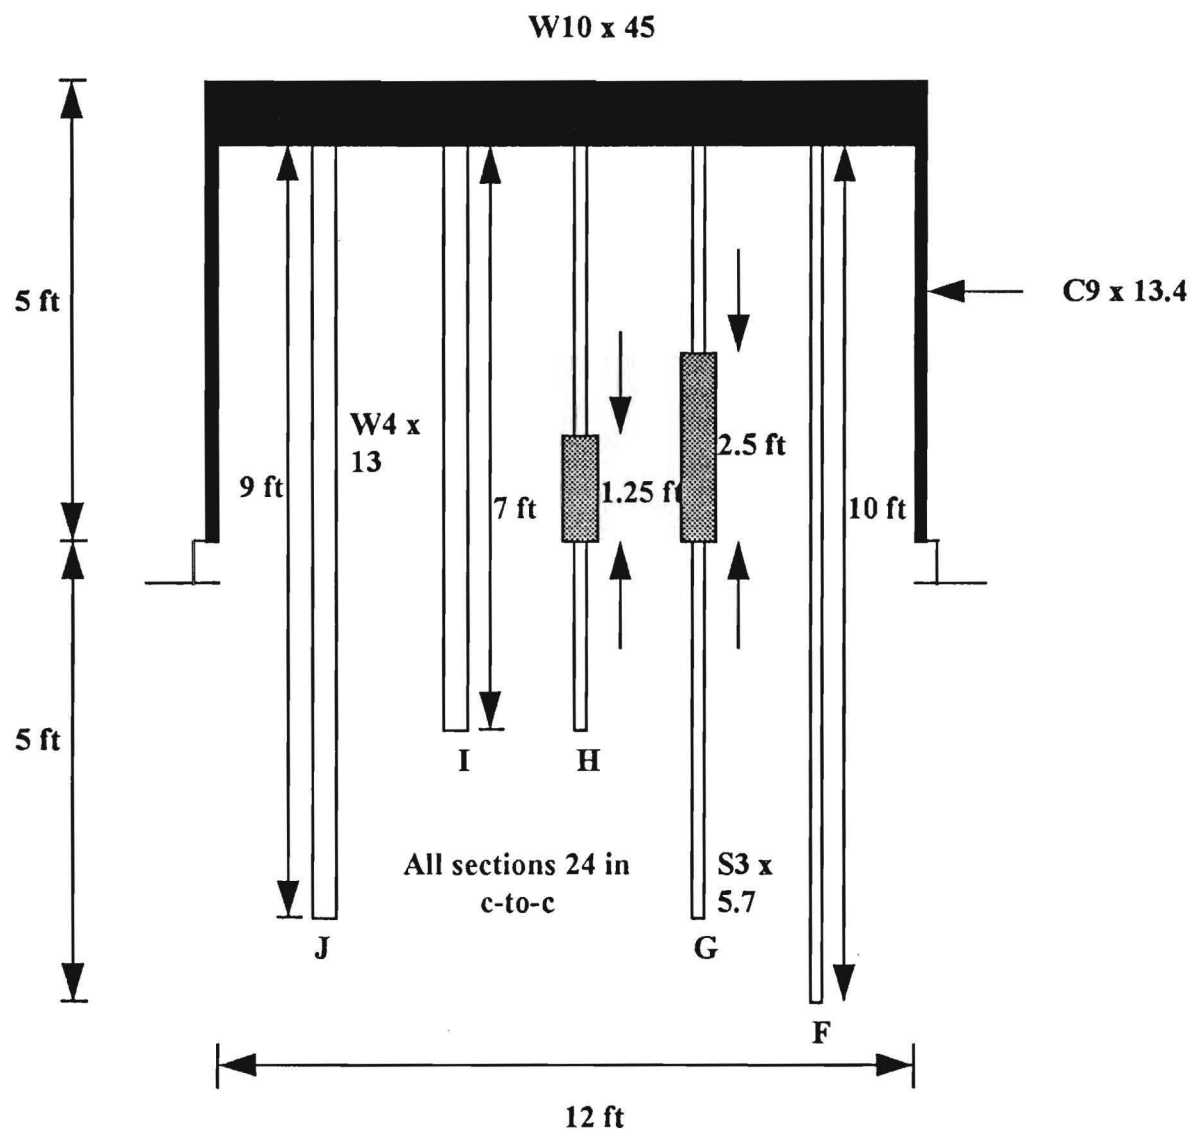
Left Elevation View of Small-Scale Pile Test Facility
